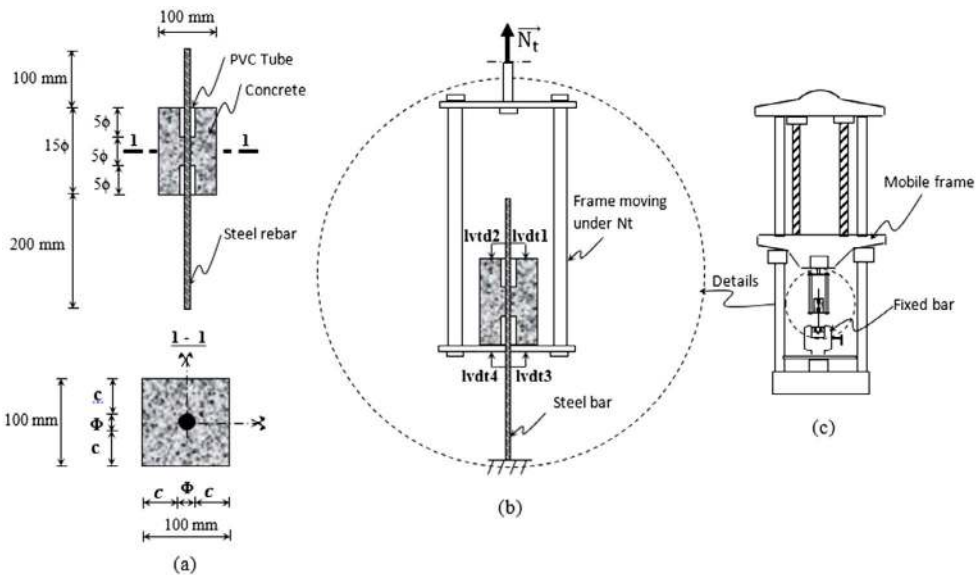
Specimen and device for the pull-out test, (a) Specimen geometry, (b) Concrete moving frame, (c) Concrete moving frame.
